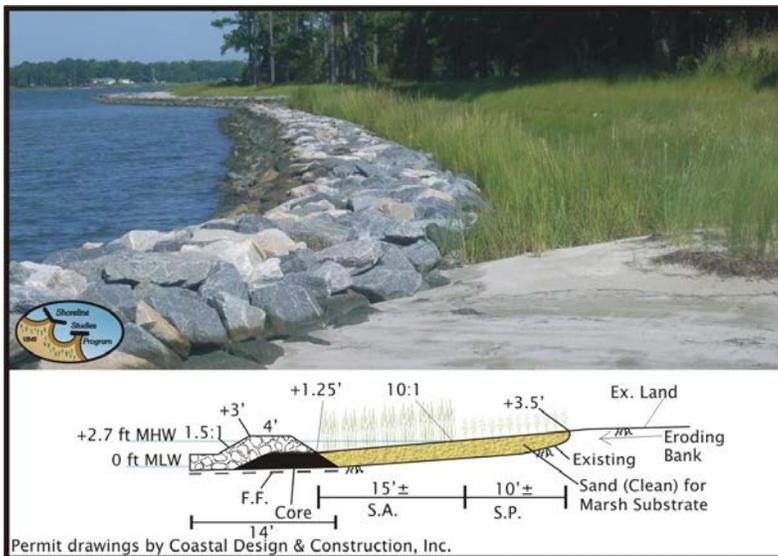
Sand fill with stone sills and marsh plantings at Poplar Grove, Mathews County, Virginia after six years and the cross-section used for construction (From Hardaway et al., 2010).
